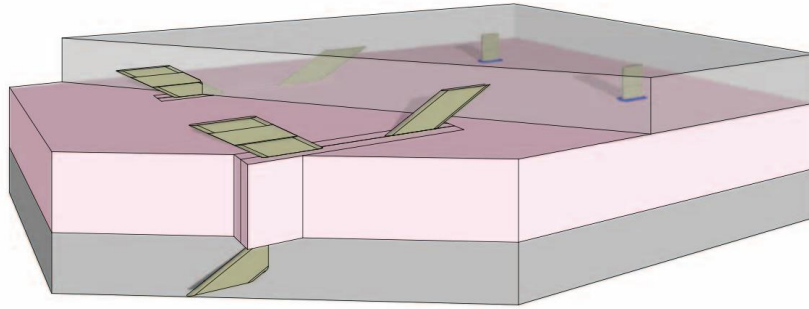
3-Dimensional Section of Sandwich Panels (Thermomass.com)
